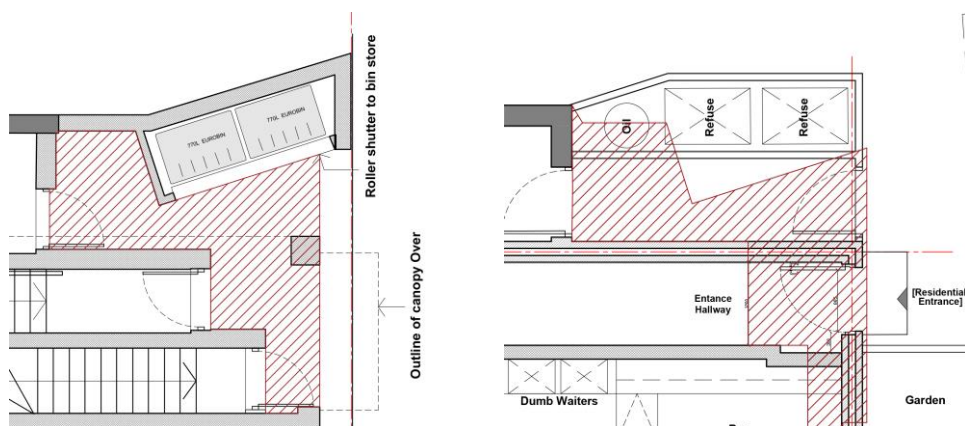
Approved (left) external space to be incorporated at the Proposed design (right)
